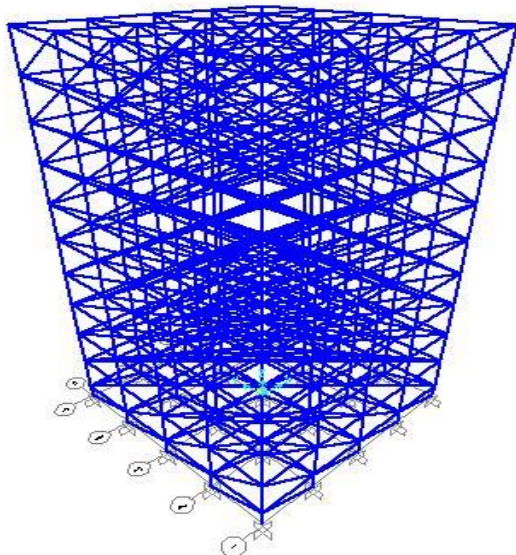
3D-view of G+9 storeys Single-Strut Model Building
